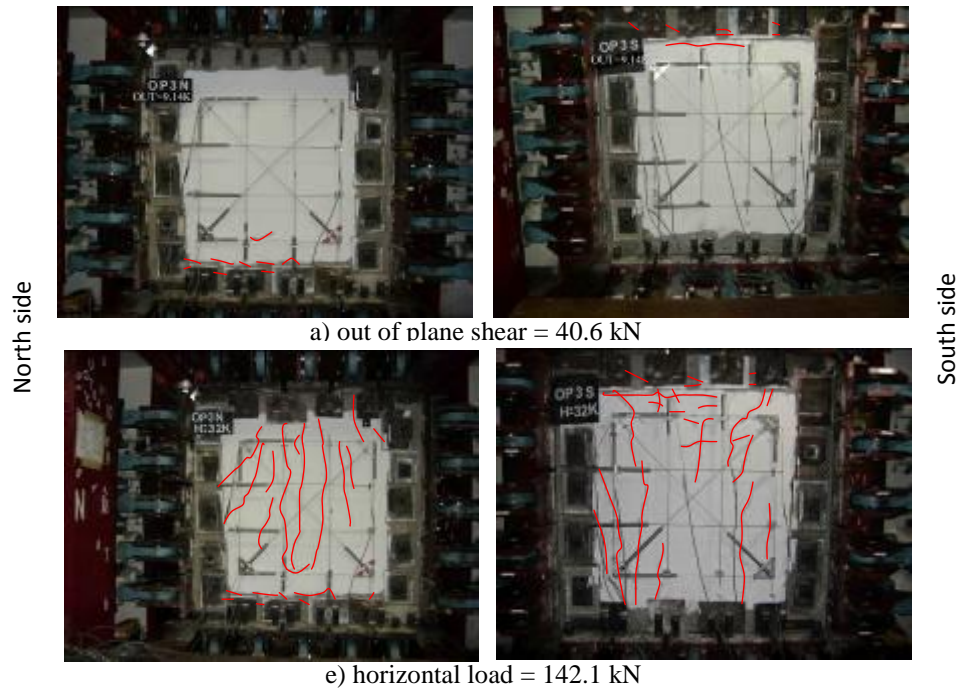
Development of cracks in panel OP3 (4.44 kN = 1 kip, major cracks are highlighted)
